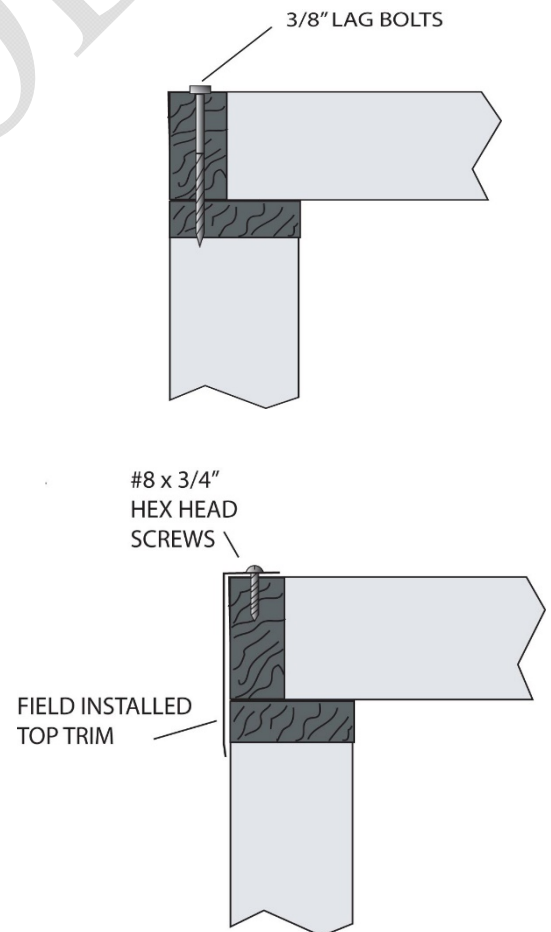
LAG BOLT TOPS TO WALLS/TRIM INSTALLATION
